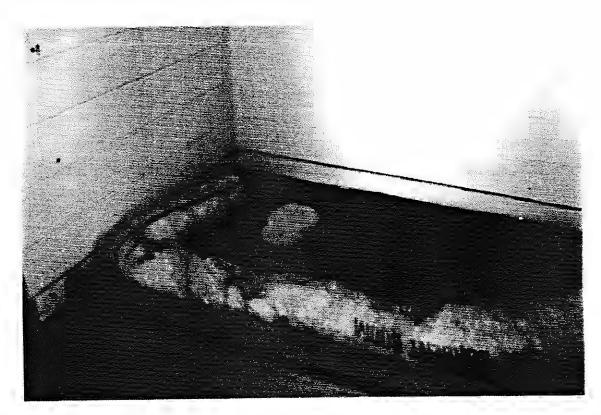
SEAD-56, 11/28/90. View of the emergency shower's sealed drain, Herbicide and Pesticide Storage Area - Building 606, facing west.
